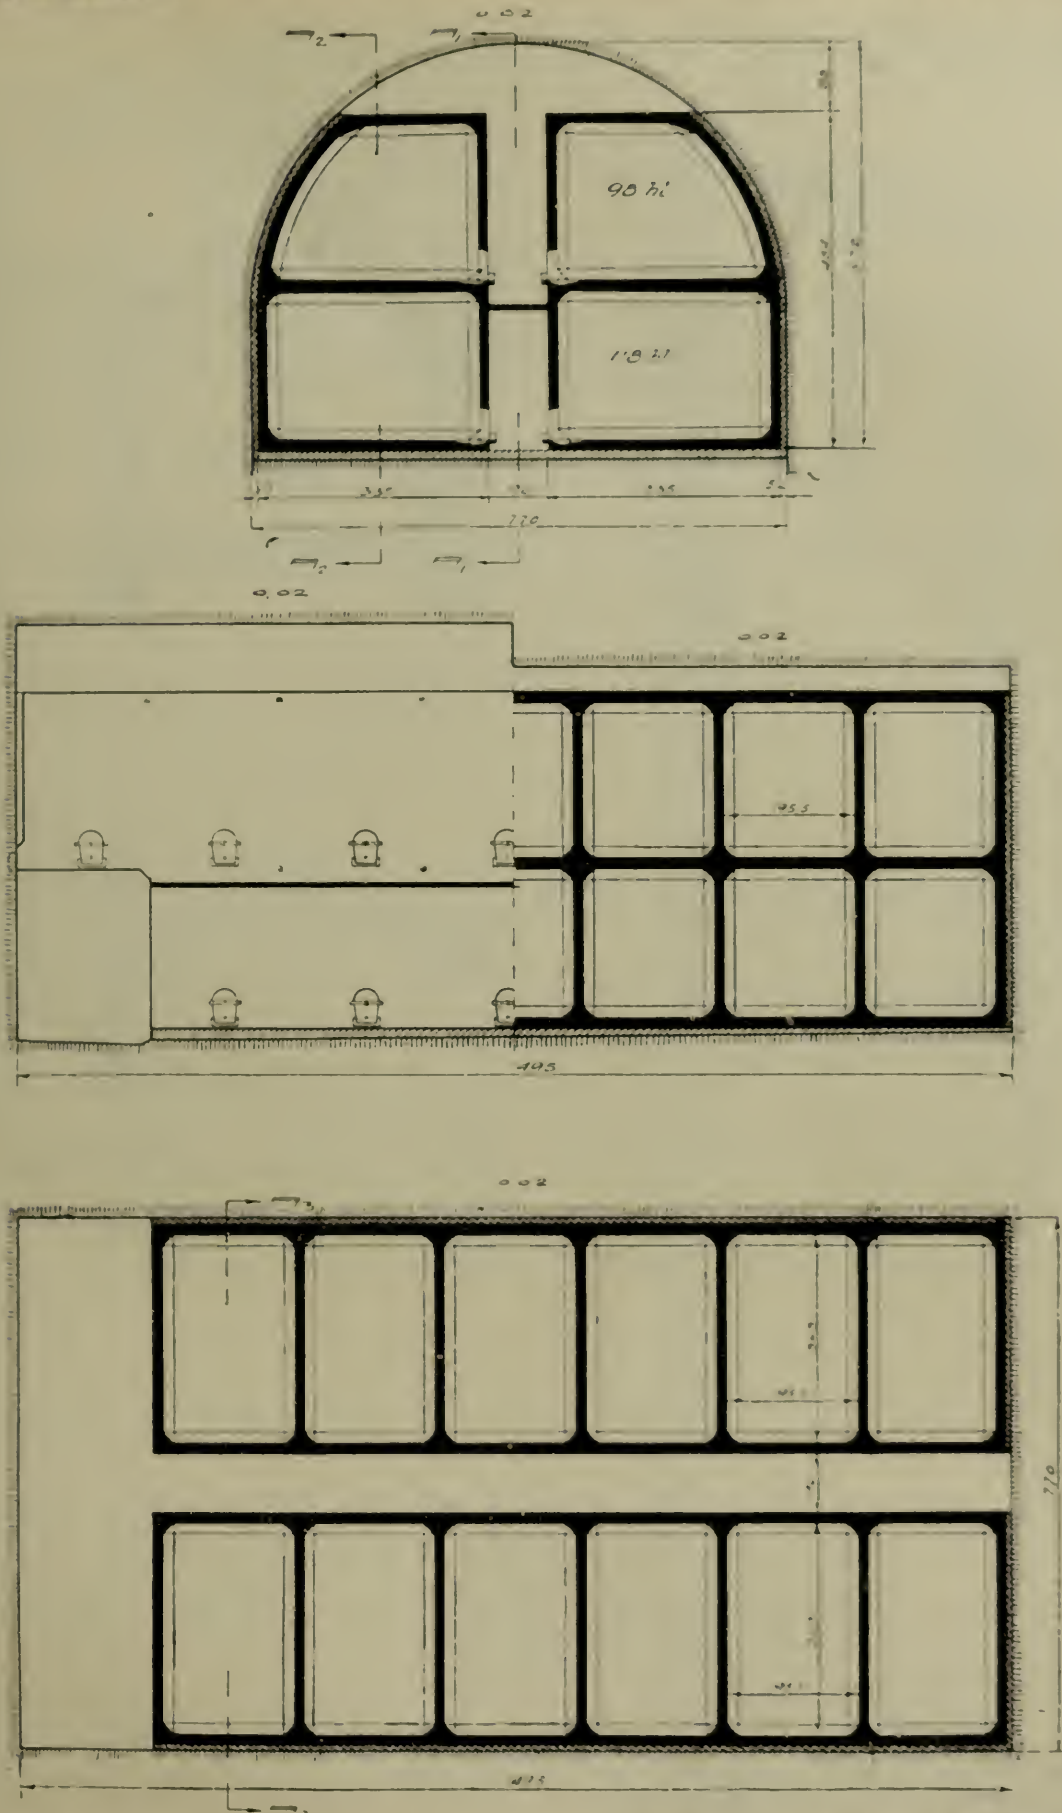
PLAN AND SECTIONS OF REINFORCED CONCRETE TANKS FOR STORAGE OF BEER UNDER PRESSURE.
